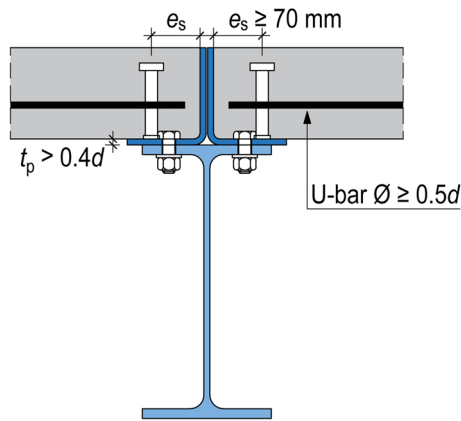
Demountable shear connection with a discontinuous slab over the beam.
